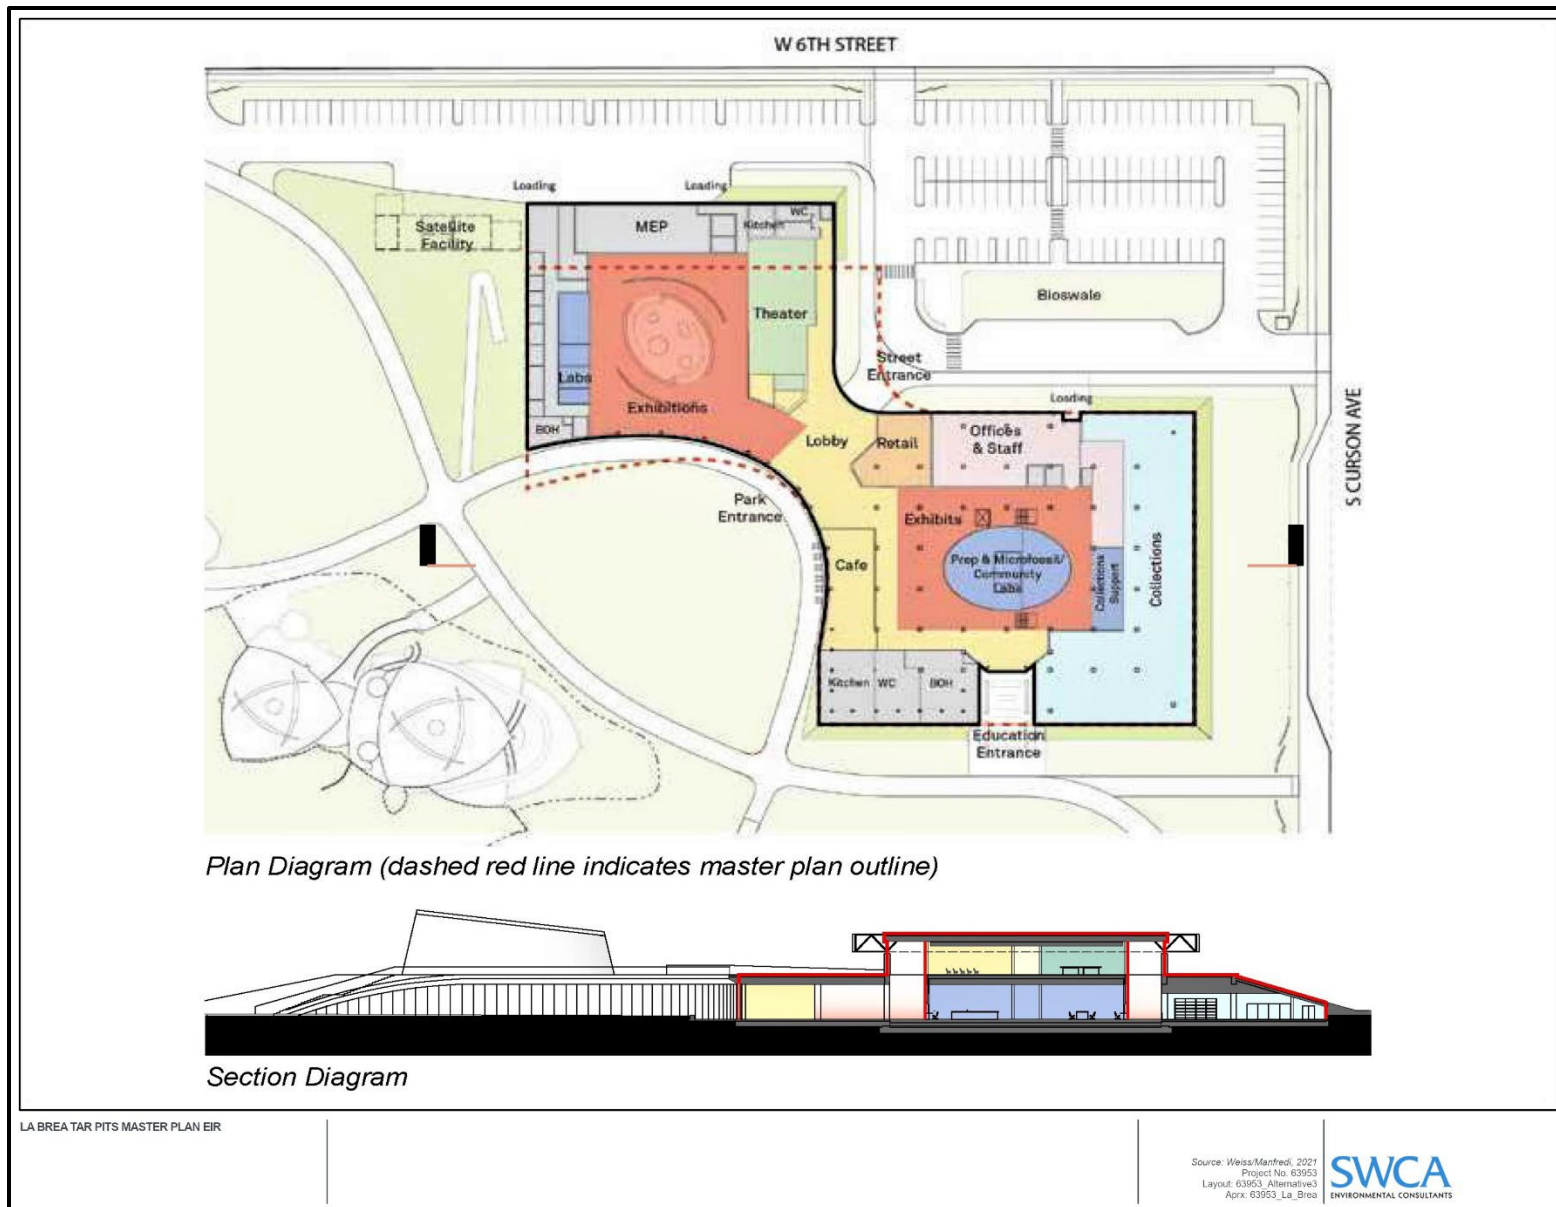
Alternative 3: Museum plan and section diagrams.
